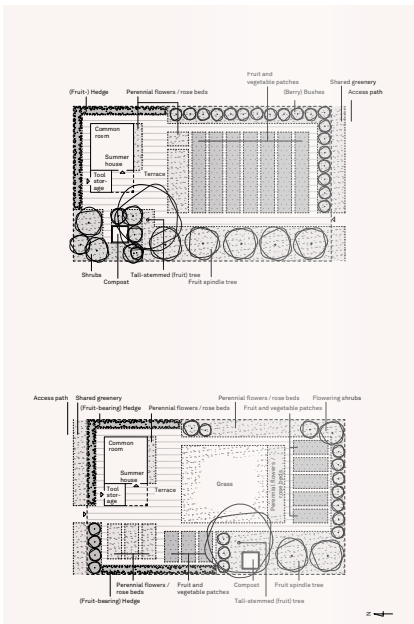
Exemplary layouts of allotment garden plots with summer houses (max. 24m<sup>2</sup> floor area)
